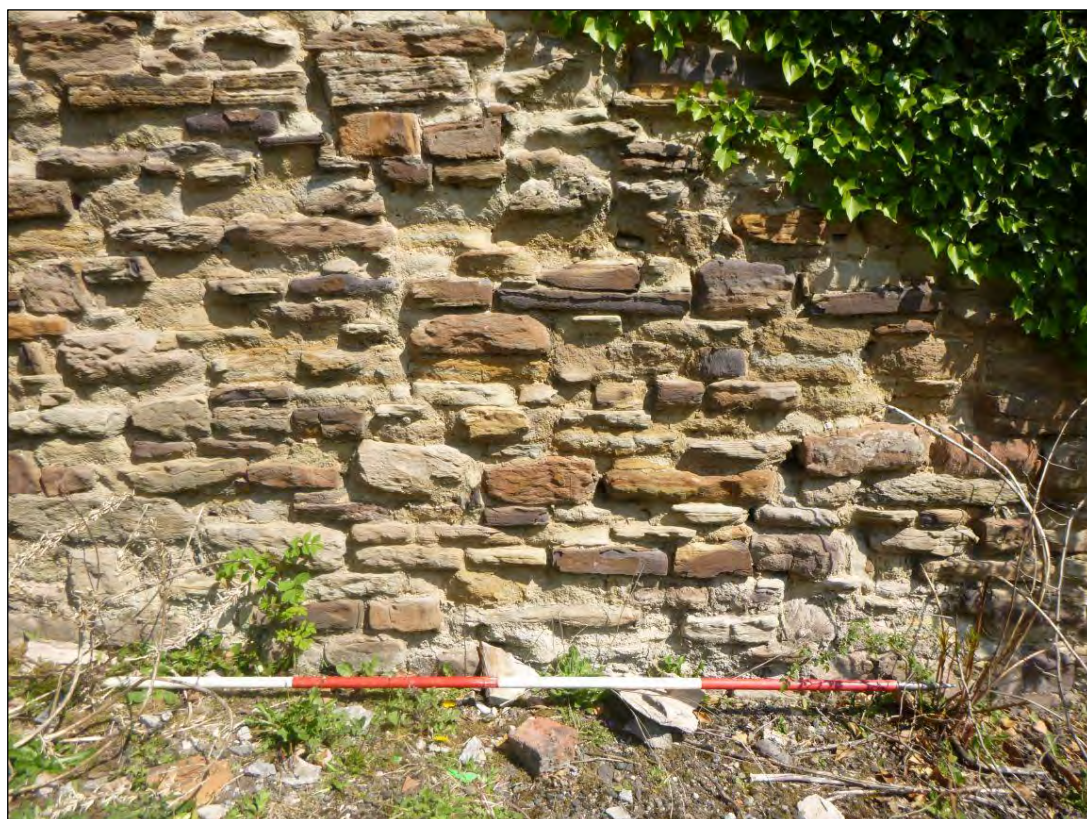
Limestone coursing of the outbuilding, southern elevation, 2m scale
